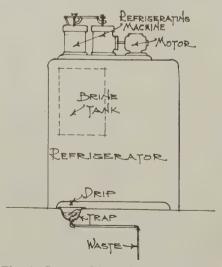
Some refrigerating machines are built into the refrigerator and the entire outfit is sold as a unit
